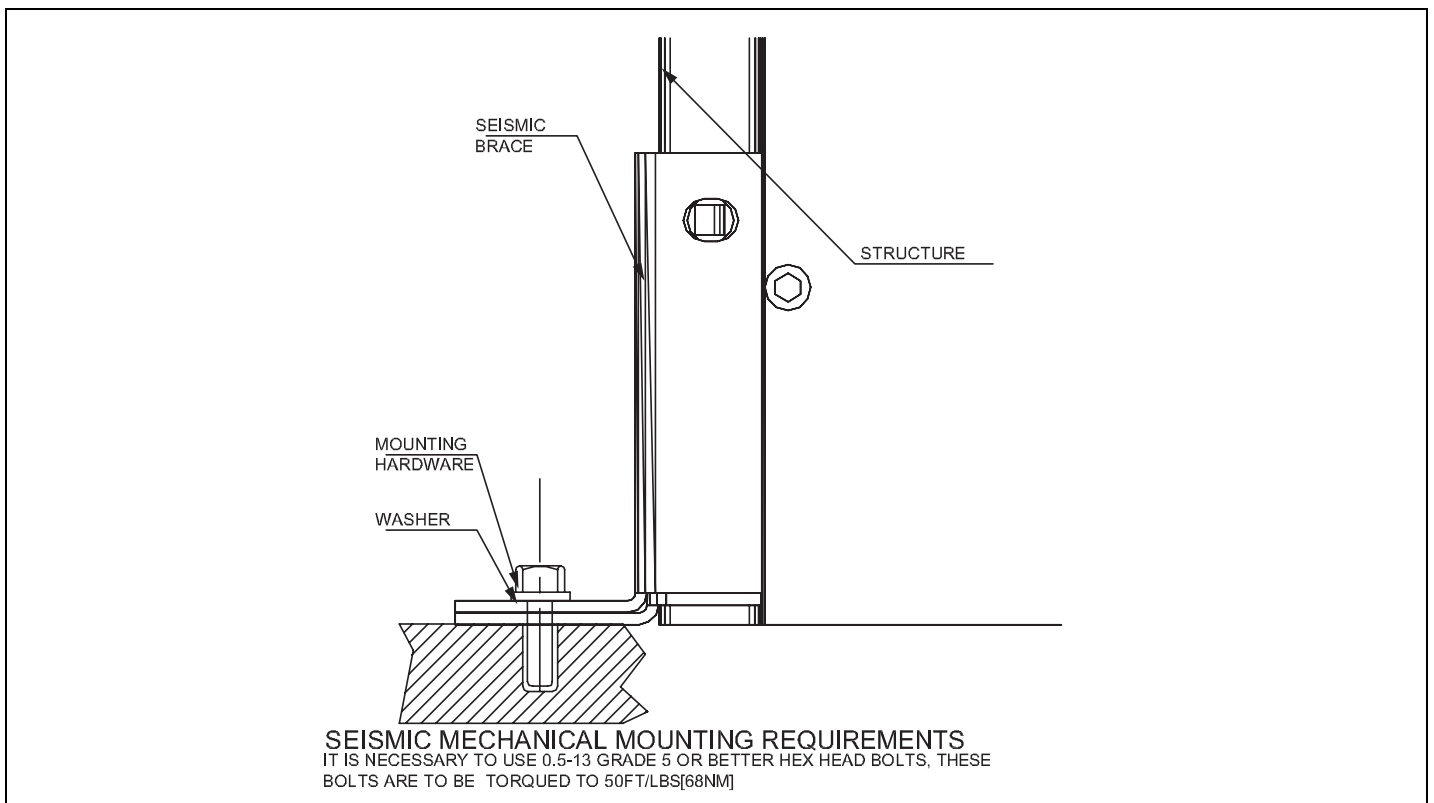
Seismic Tested and Approved Product Mounting Instructions.
